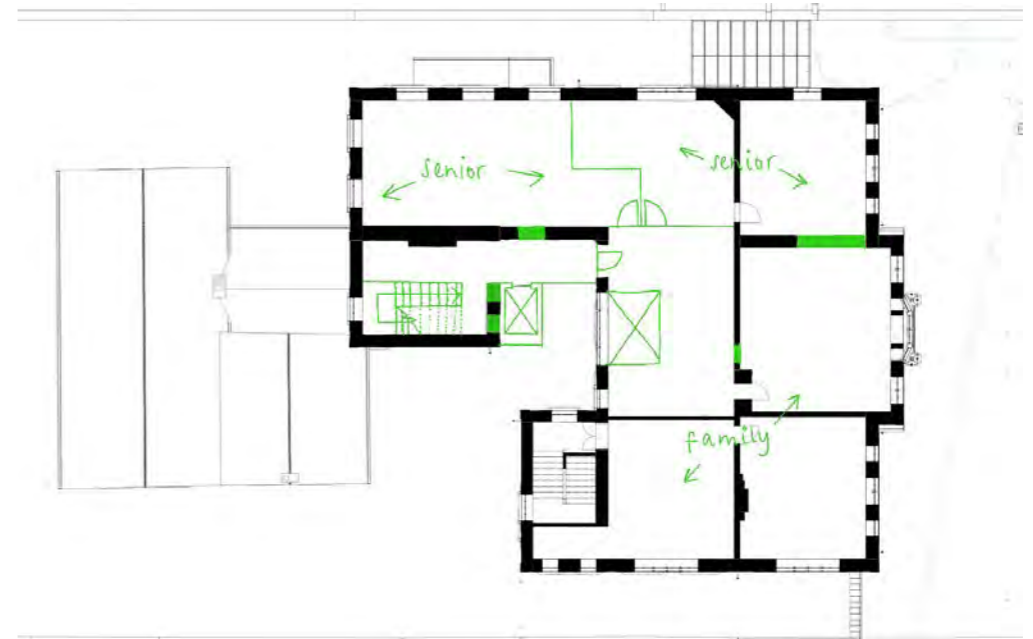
Author's Own. 2024. First Floor Space Plan Sketch.
